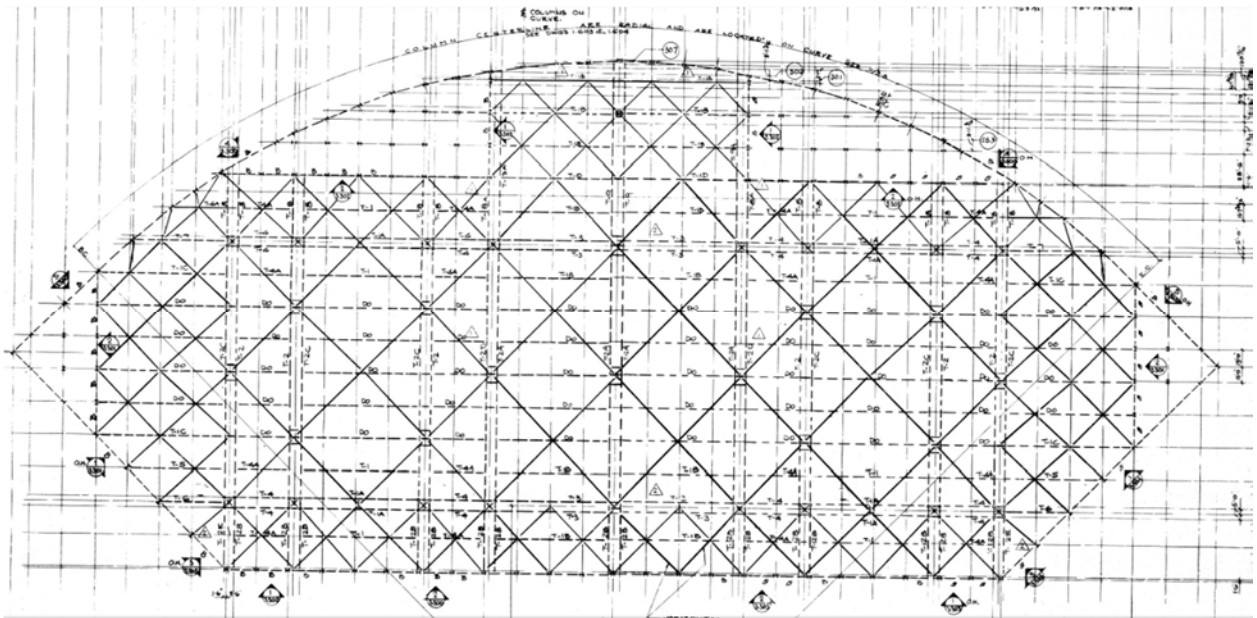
South Hall main exhibition hall, showing mega-trusses, roof diaphragm, and perimeter braced frames.
